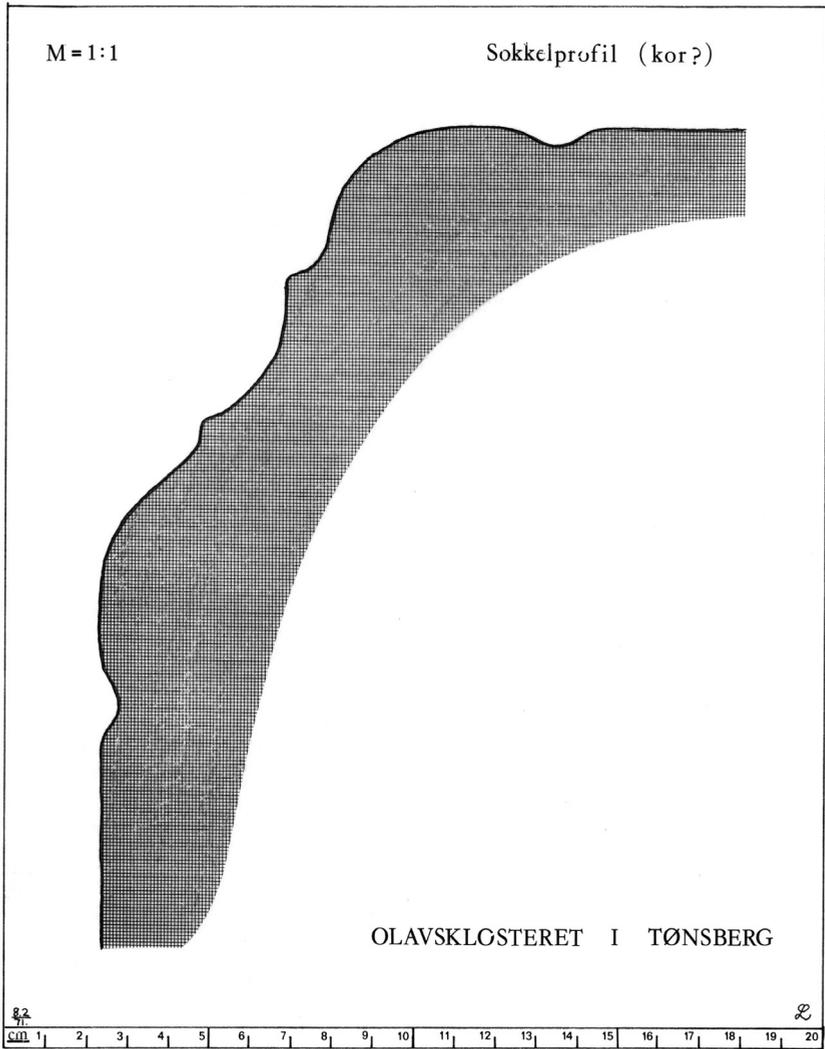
Base profile around the apsis wall. Illustration: Ø. Lunde.
